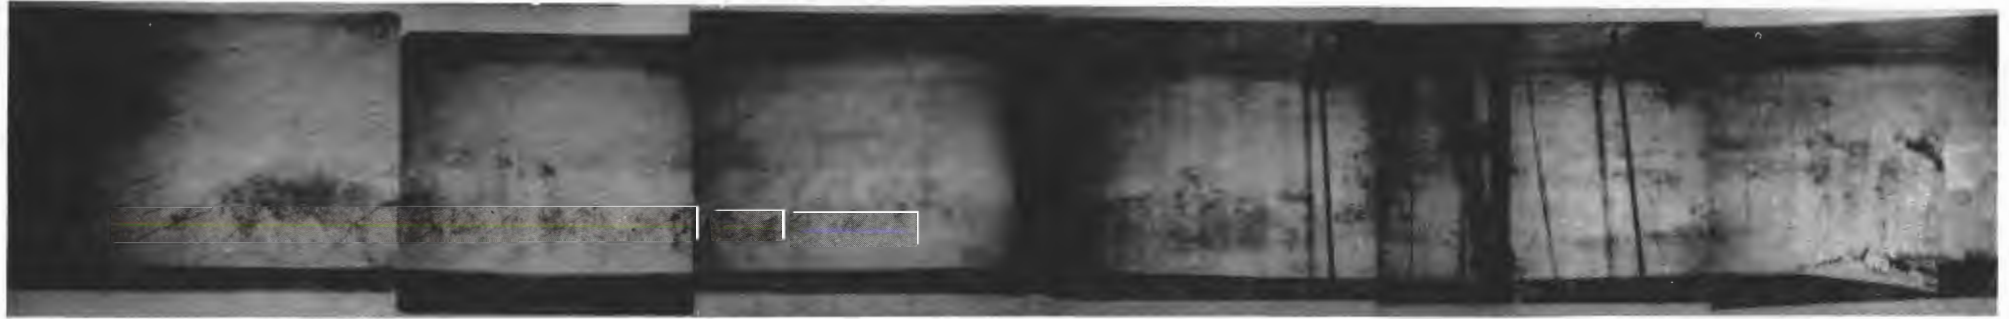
Crack Pattern of Girder 2 After Derailment Test
